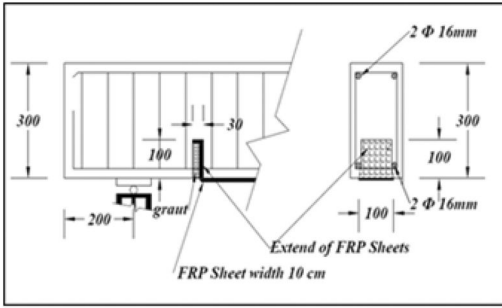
Beams strengthened with CFRP sheets embedded through vertical gap.
